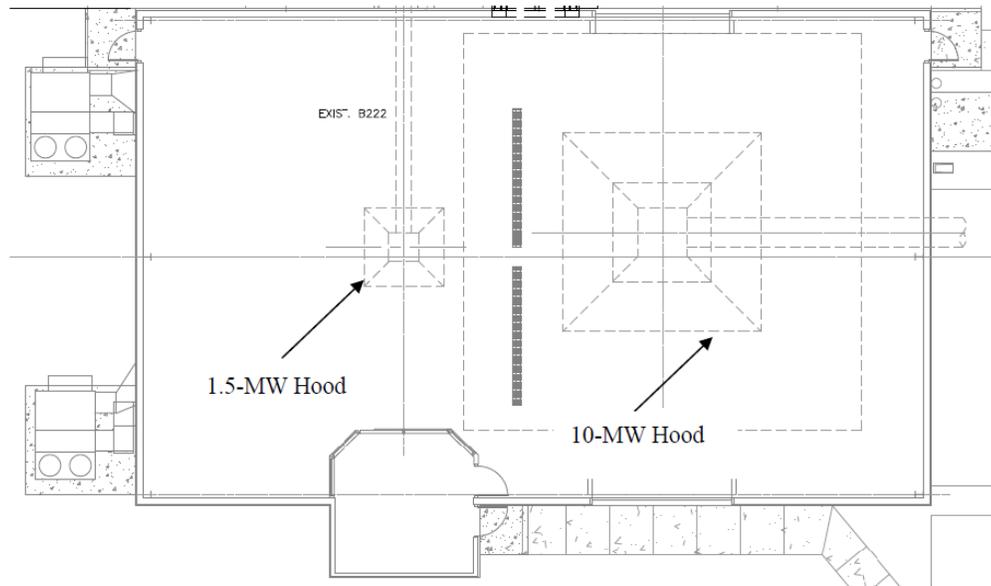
Plan View Schematic of SwRI's Calorimetry Test Facility.
